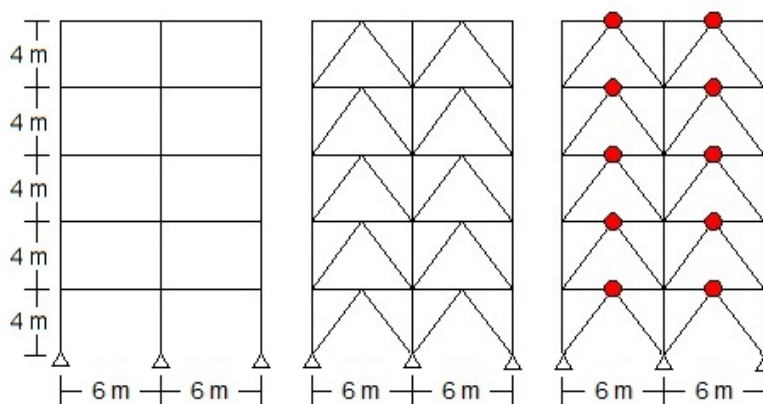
Structural configurations to evaluate: a) structure without lateral reinforcement, b) braced frame structure, c) hysteretic steel plate dampers.
